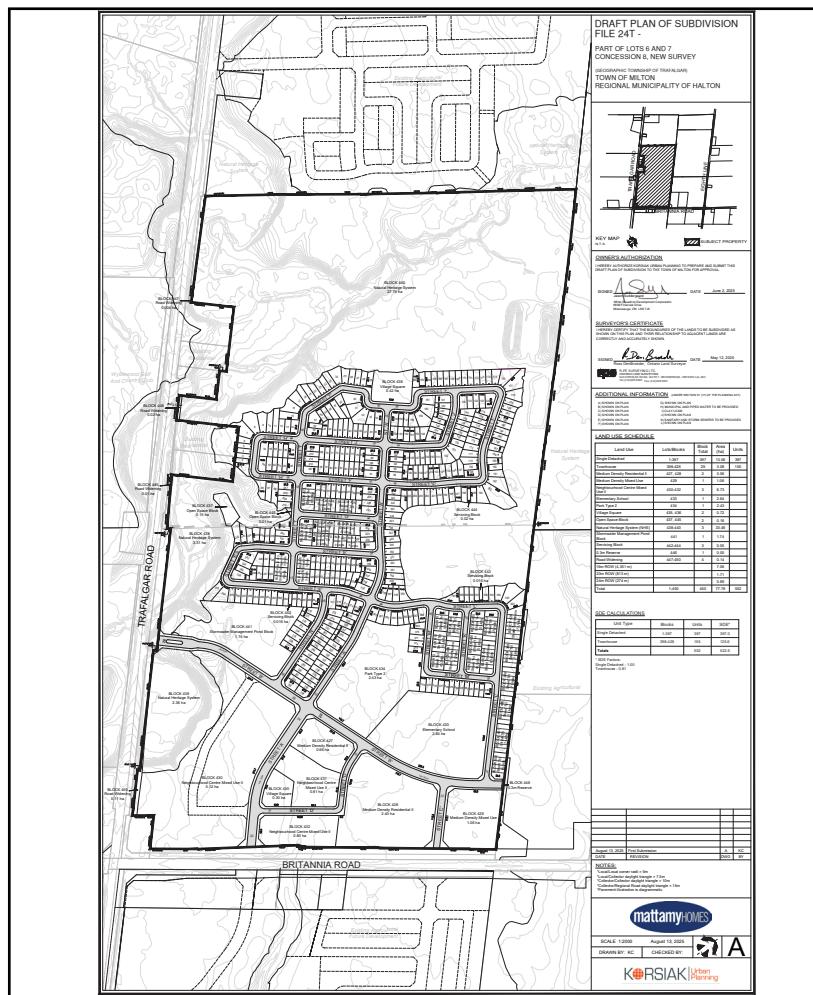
DRAFT PLAN OF SUBDIVISION
